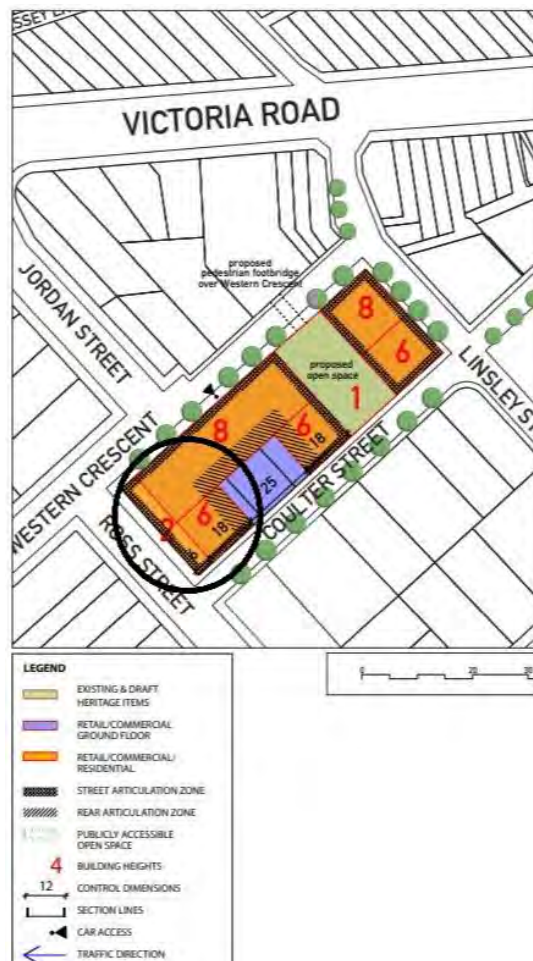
Block 18 Built Form Plan (subject site denoted by black circle)
